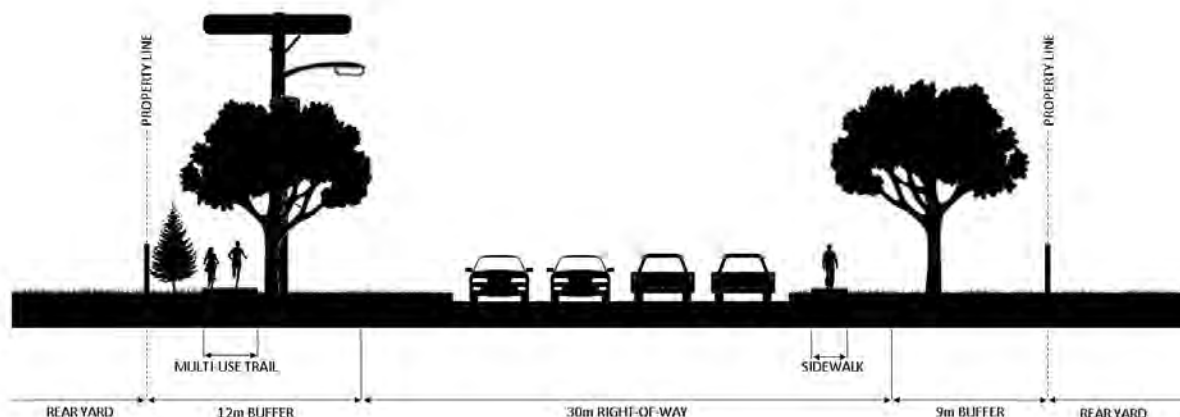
Typical Arterial Road Section in an Interim Rural Context
